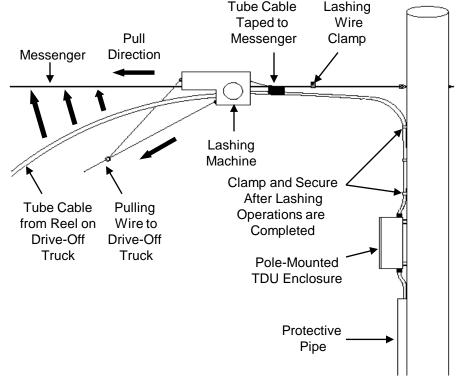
Drive-Off Method for Aerial Installation with a Lashing Machine
